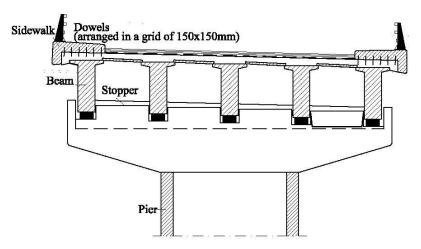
Cross-section of the sidewalk-restrainers at the anchorage length (Section A-A in Fig. 2.1)
